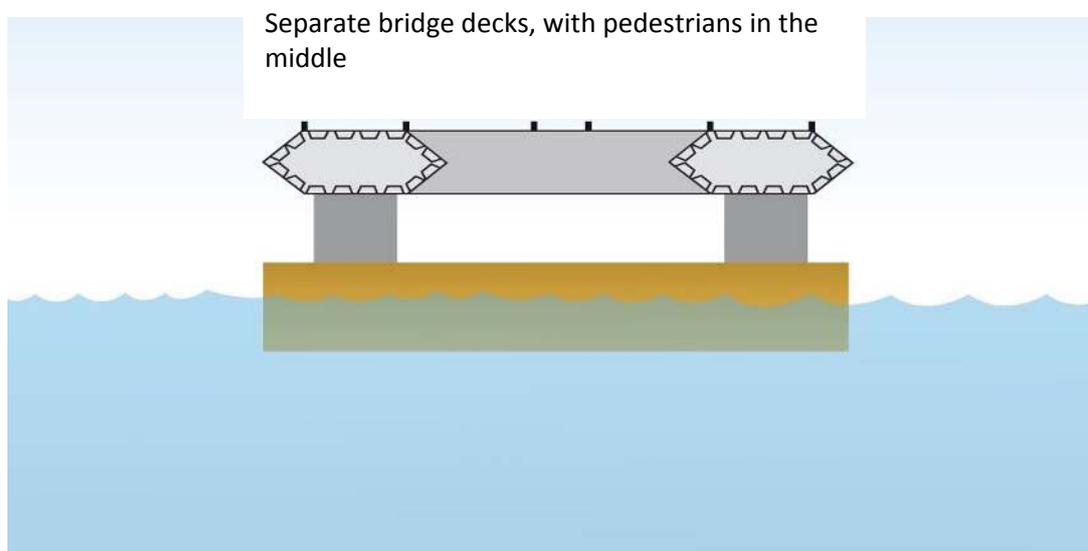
Principle sketch, separate bridge decks and pedestrian lane
